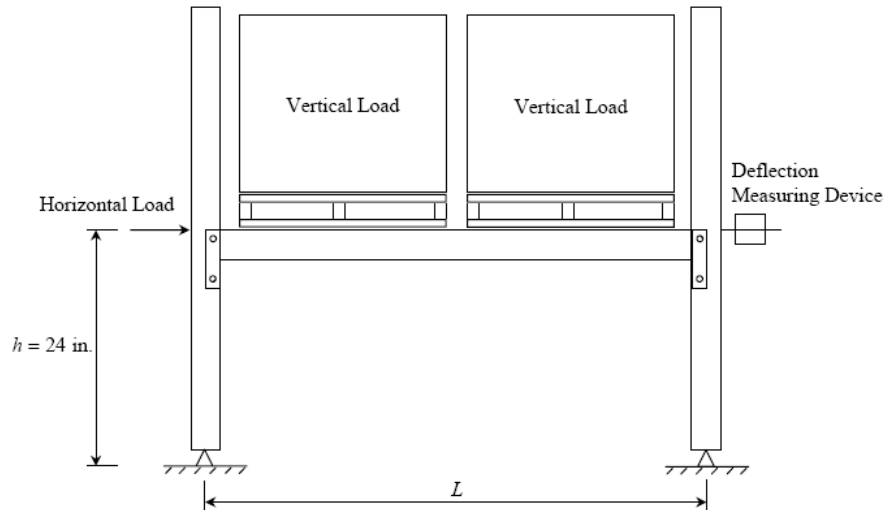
Portal test – beam to column connection test (RMI, 2000)
